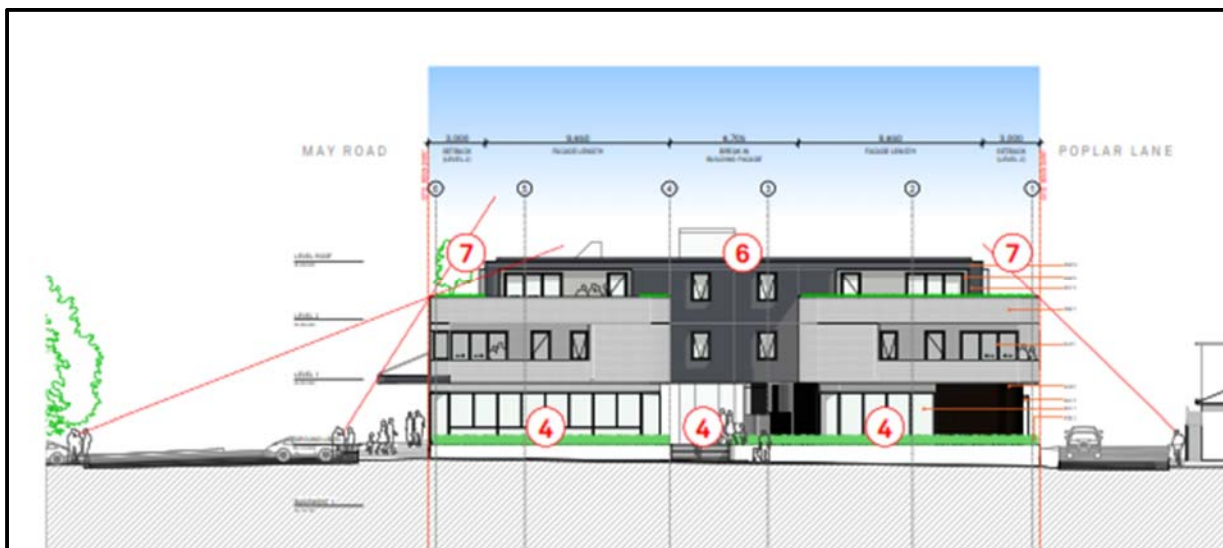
East Elevation – view from pocket park (Source: Benson McCormack, Project No. 1853A)
